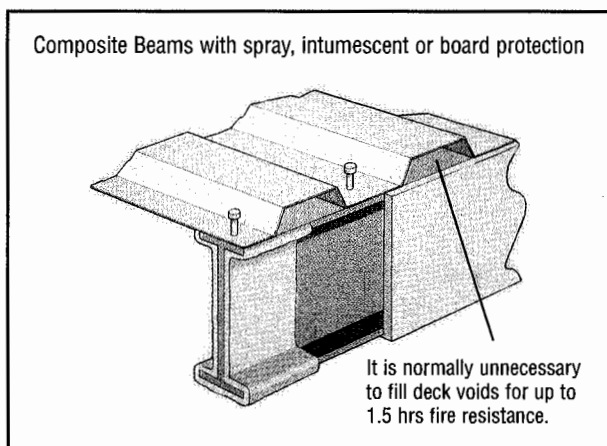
Composite Steel Deck Floor with Unfilled Voids.
